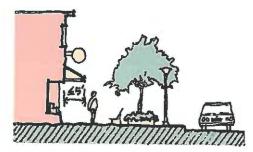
Exterior weather protection generally should not overhang for more than 5 feet from the building.
